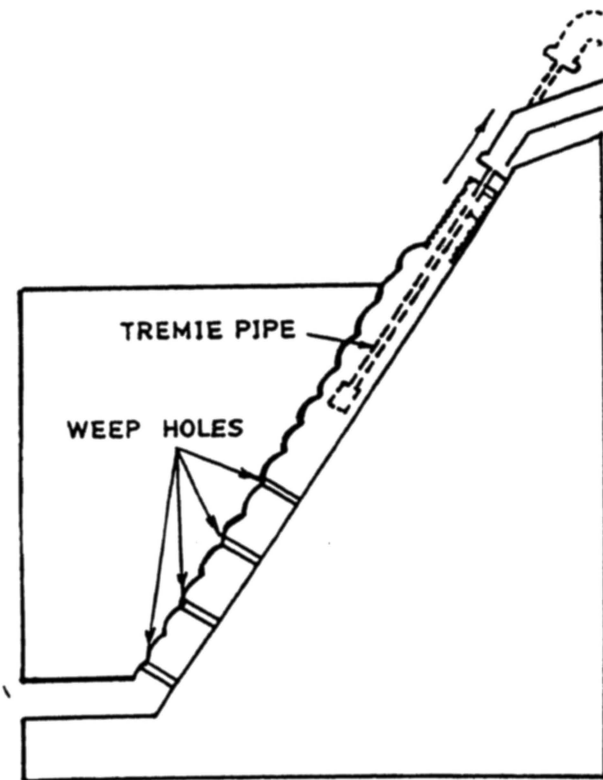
Typical Cross Section of Canal Showing Grouting Procedure
